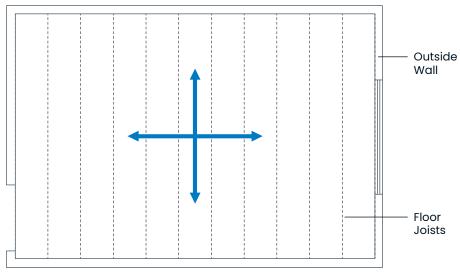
For a wood-finished floor covering, install Quik Trak panels perpendicular to the direction of the finished-wood floor boards.
